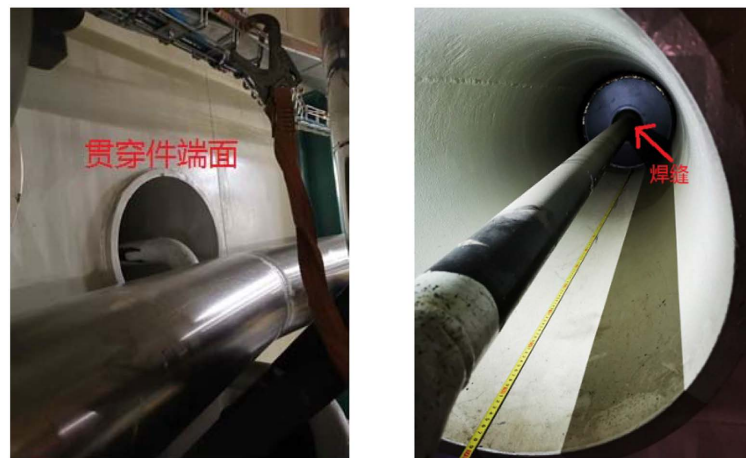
Welds locations of PRS system containment penetrations
